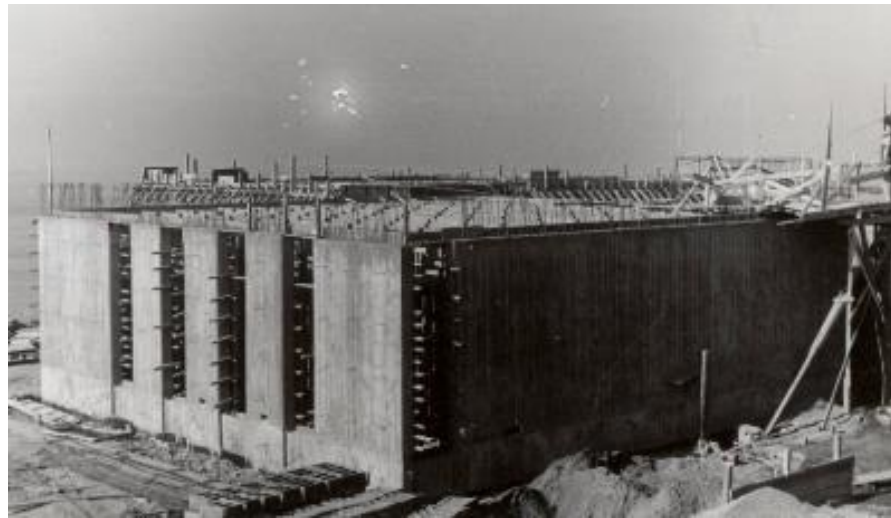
Photograph from the construction phase of walls at Faculty of Architecture building. (Salt Archives)
